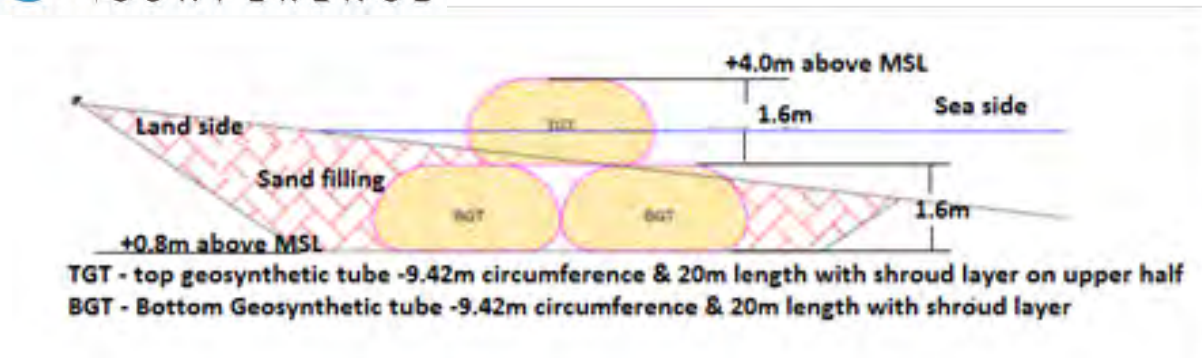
Typical Layout of Geotextile Tube Structure for Groynes.
